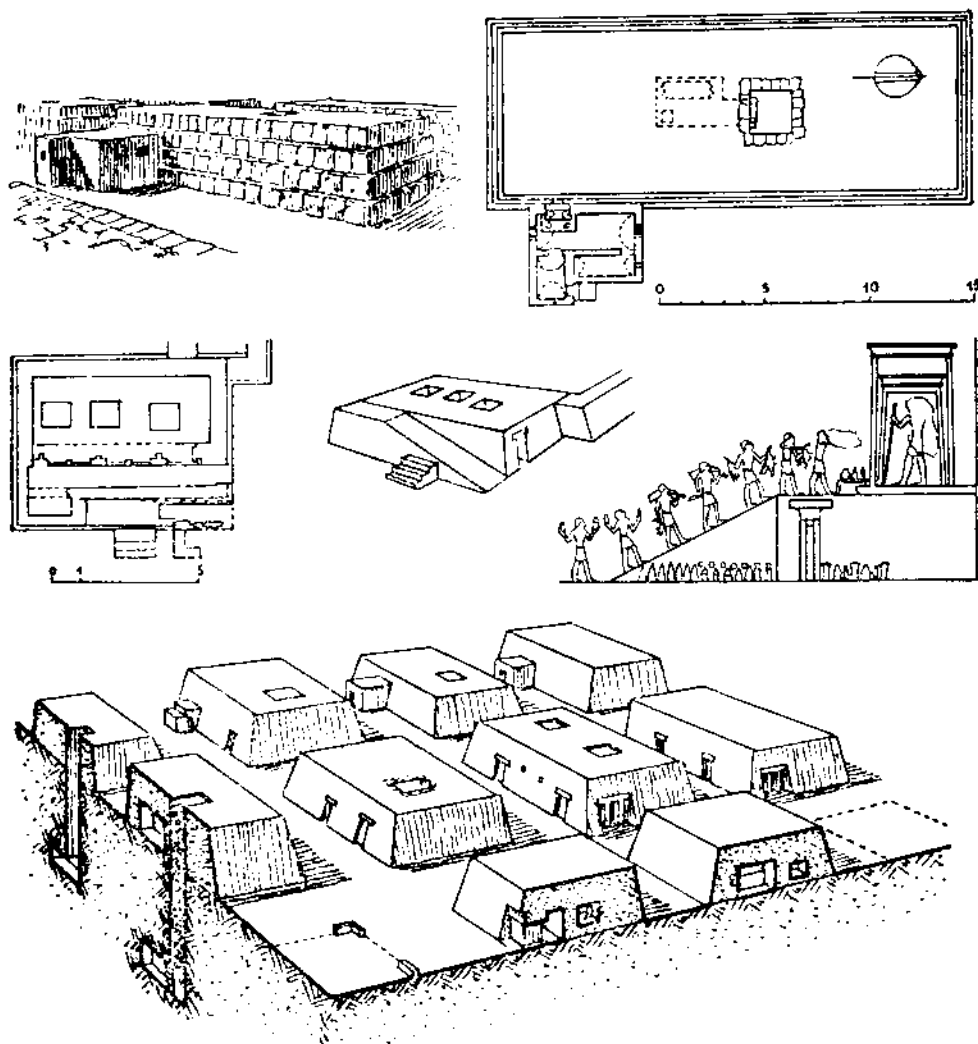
Plan and perspective of a IVth dynasty mastaba at Giza, drawing of a mastaba with ramp, plan and restored perspective of the mastaba of Mery, and view of the IVth dynasty necropolis at Giza.
